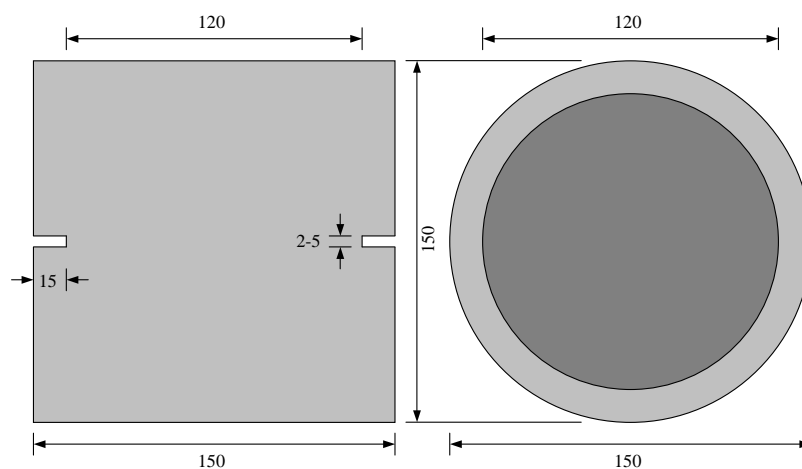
Dimensions of the RILEM uniaxial tension test specimen
